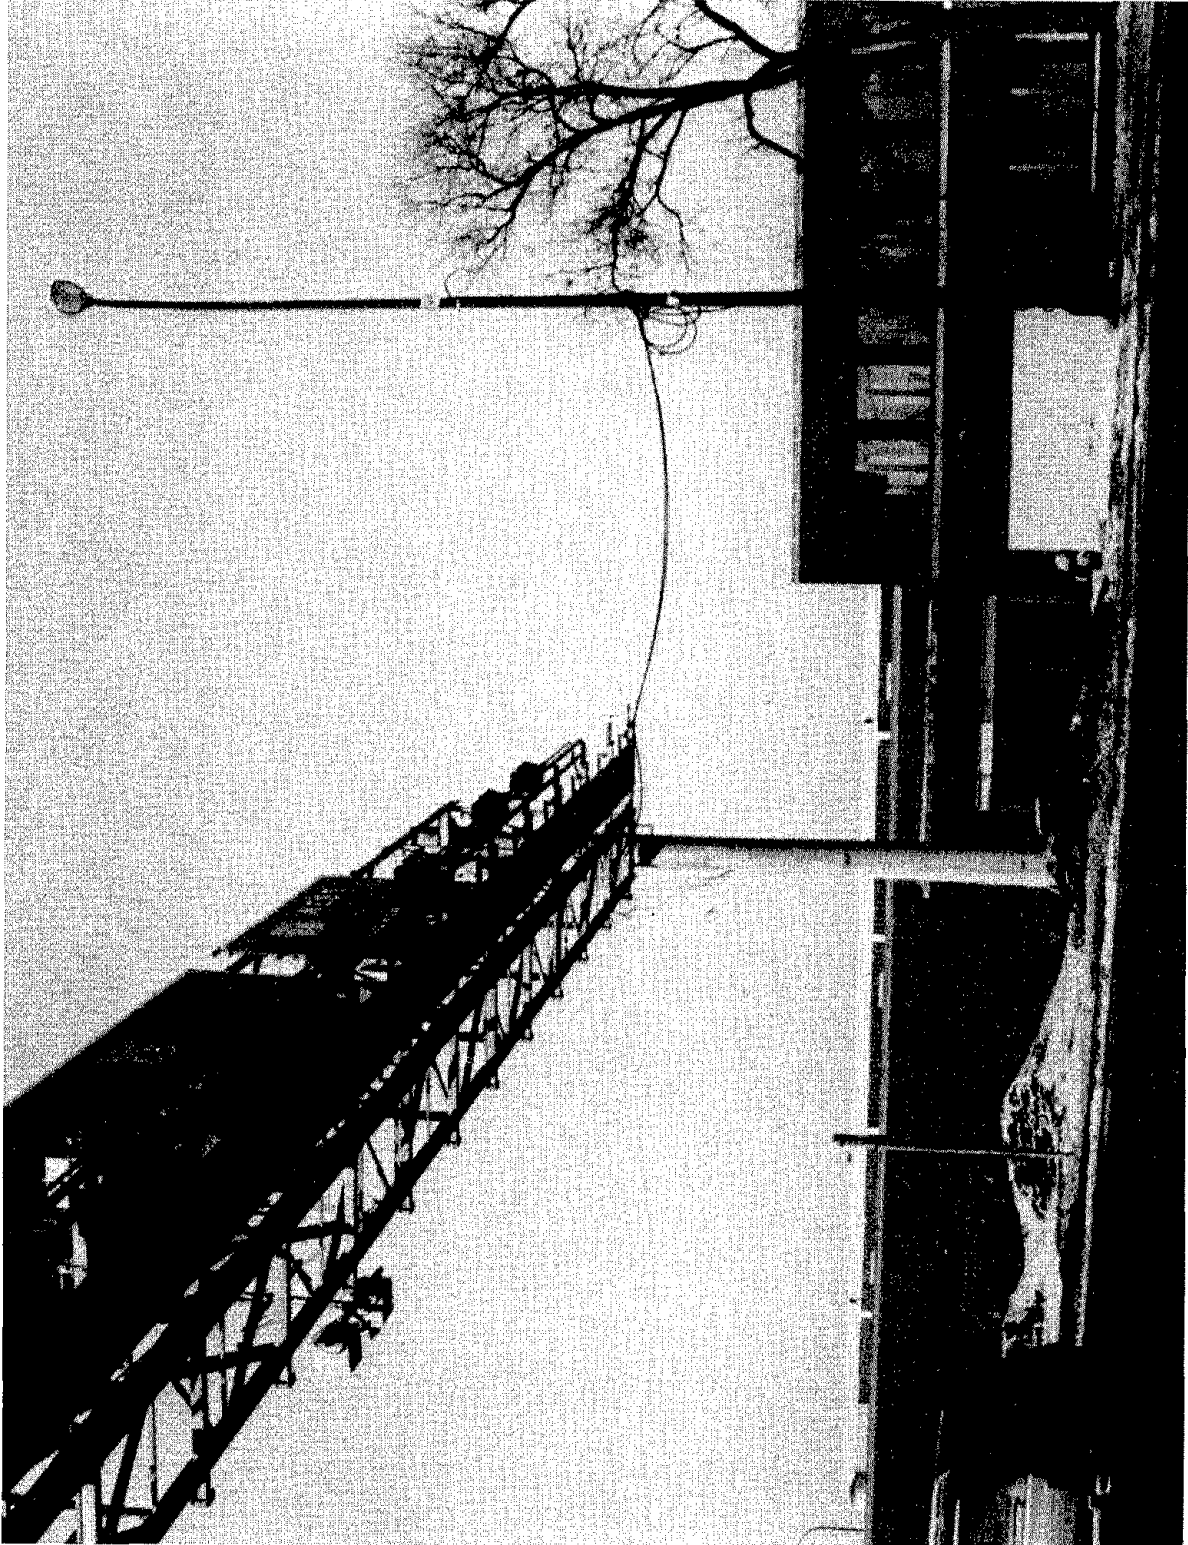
Olson Highway Overhead Bridge Showing Detectors Mounted on Sign Bridge and Light Pole
